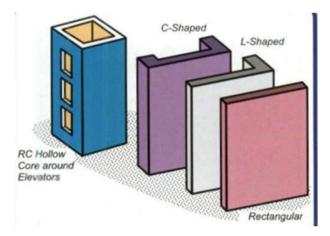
Shear wall in RC buildings(Source: IITK-BMTPC Earthquake Tips)
